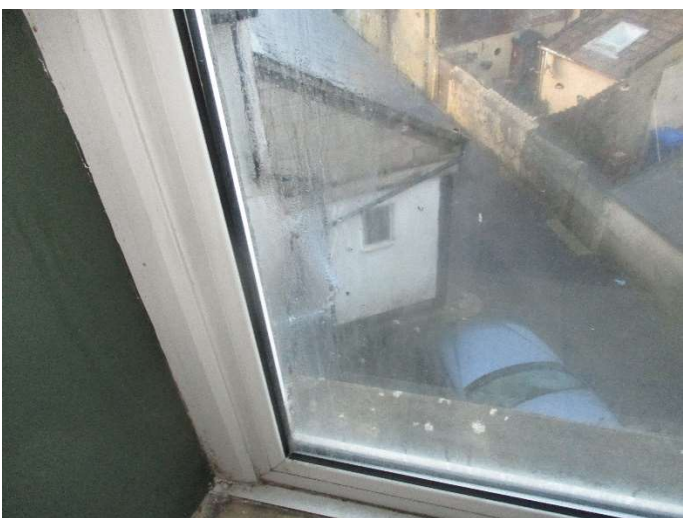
uPVC double glazed units within theatre have failed to right side elevation with condensation between the panes
